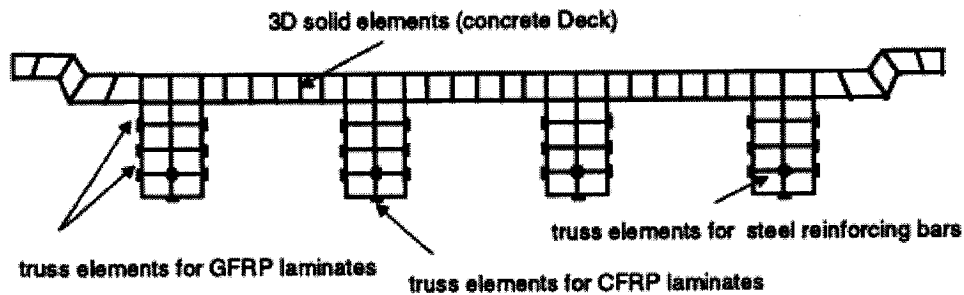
Typical cross section of the FEM model for a repaired bridge structure
